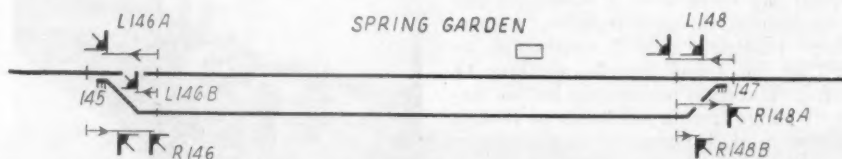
Typical Switch and Signal Layout at Spring Garden
